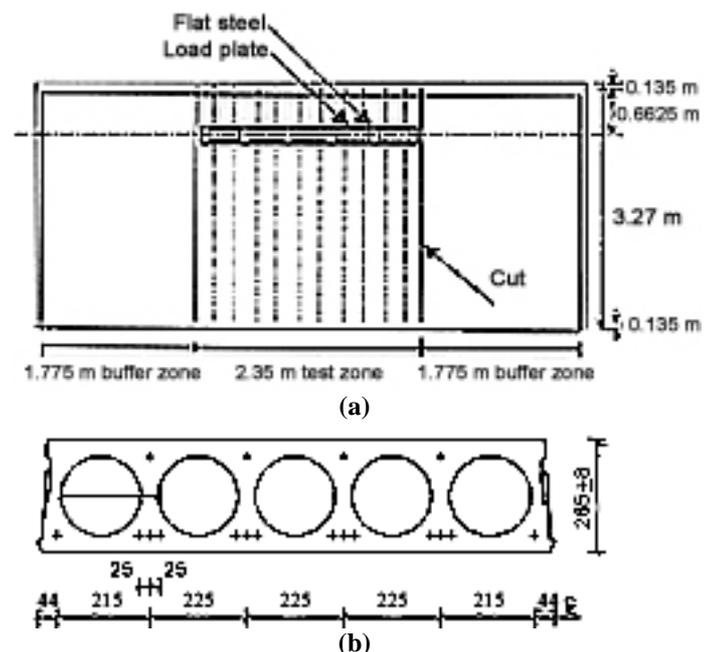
(a) Test layout (b) HC dimension from BEF (2005)
